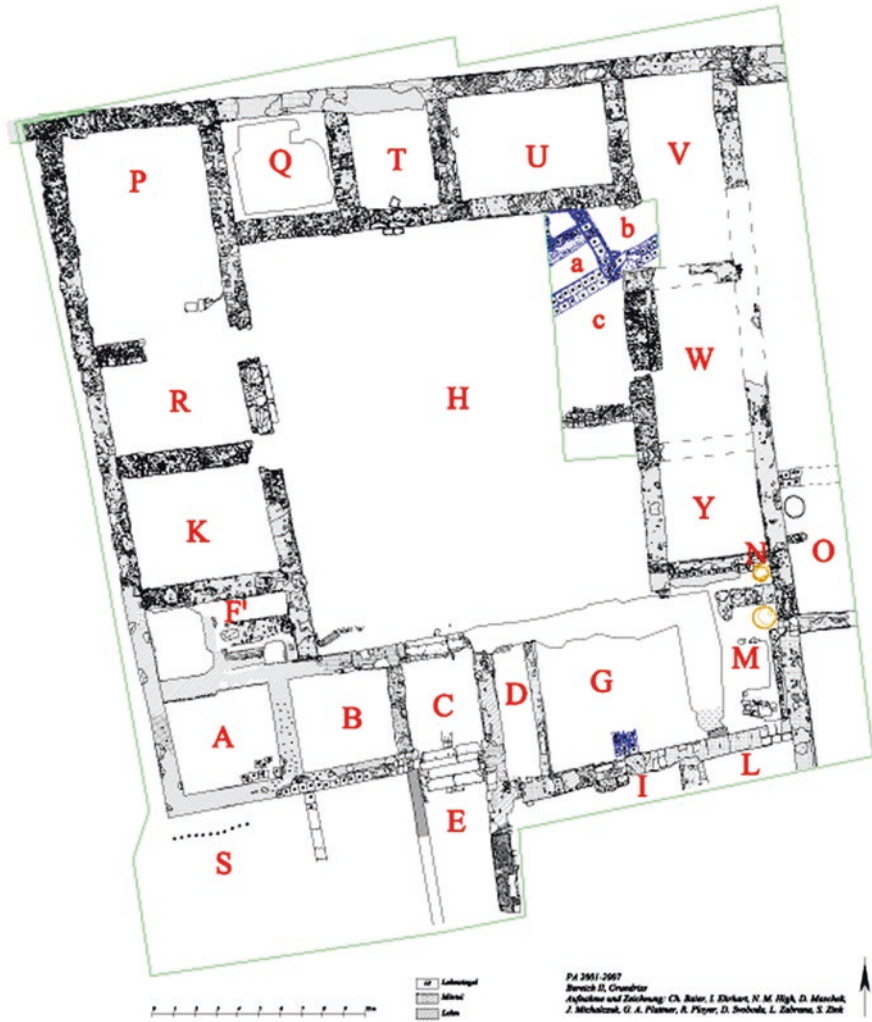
Palmyra, Sondage II, Groundplan of the 'Khan'
